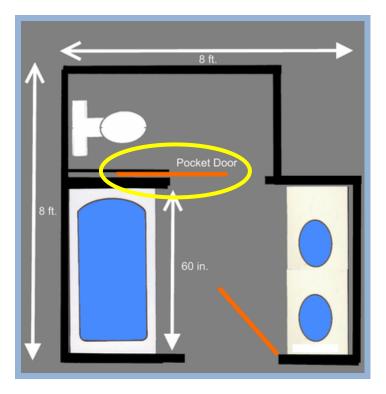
The pocket door slides out of the ell wall within the bathroom to provide an extra measure of privacy.
